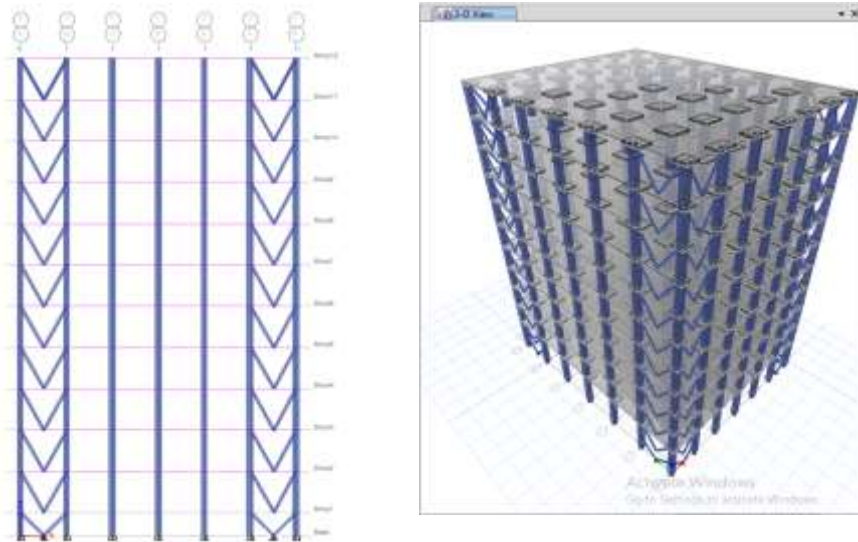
Elevation and 3D view of Multi-storey building with V bracing at Corner side
